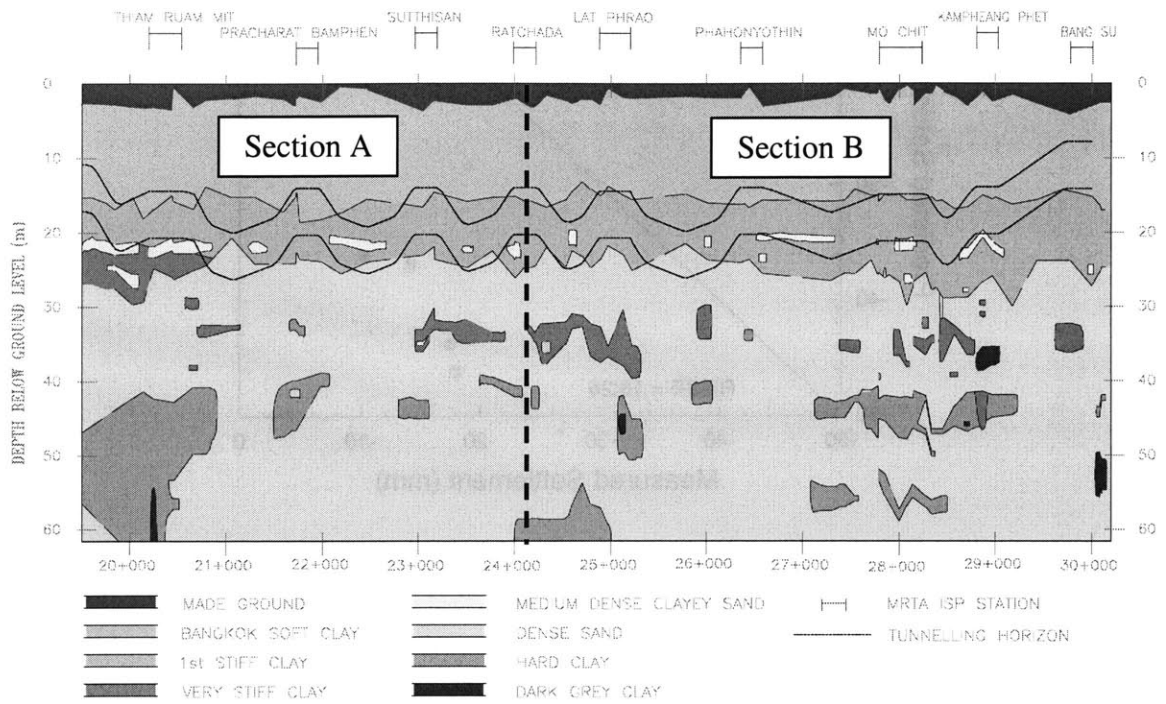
Geological profile of North Tunnel Section representing Sections A and B
